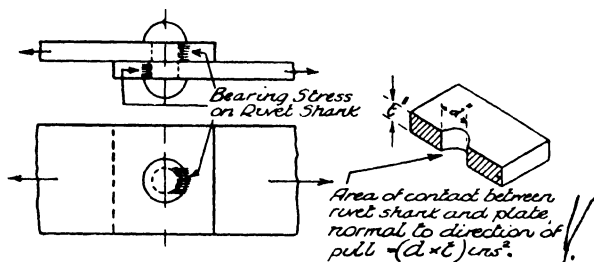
BEARING STRESS IN RIVET OR BOLT.
